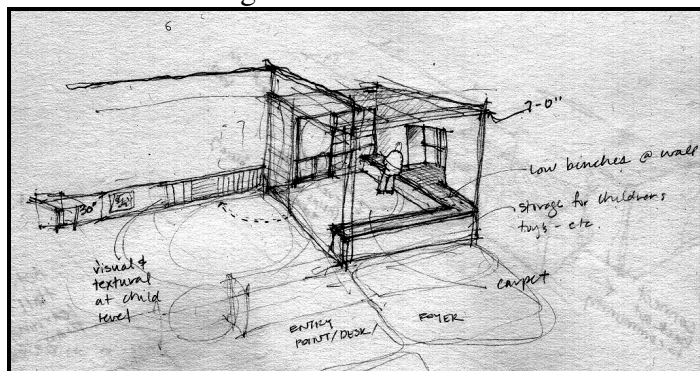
Sketch of homeroom layout and connection of spaces.⁴
